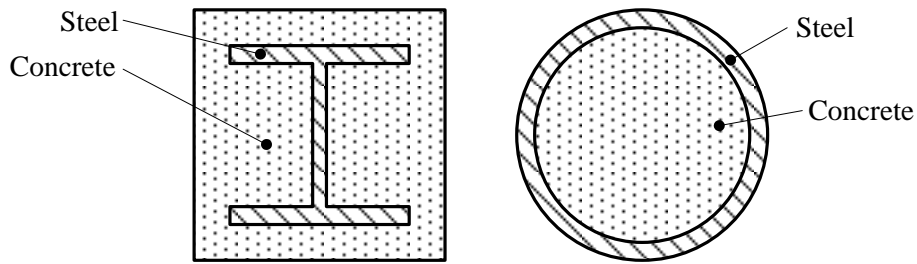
Examples of concrete-encased (left) and concrete-filled (right) sections
